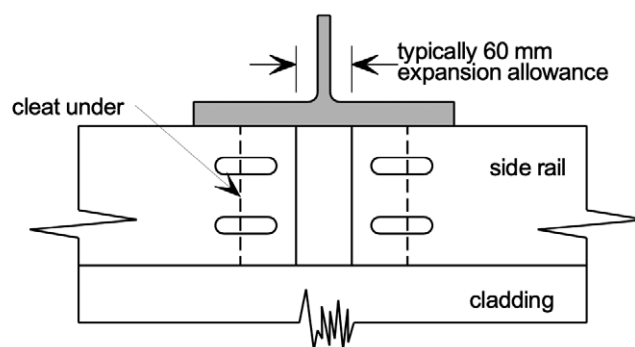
Provision for expansion at the side rail connections (but not cladding)
